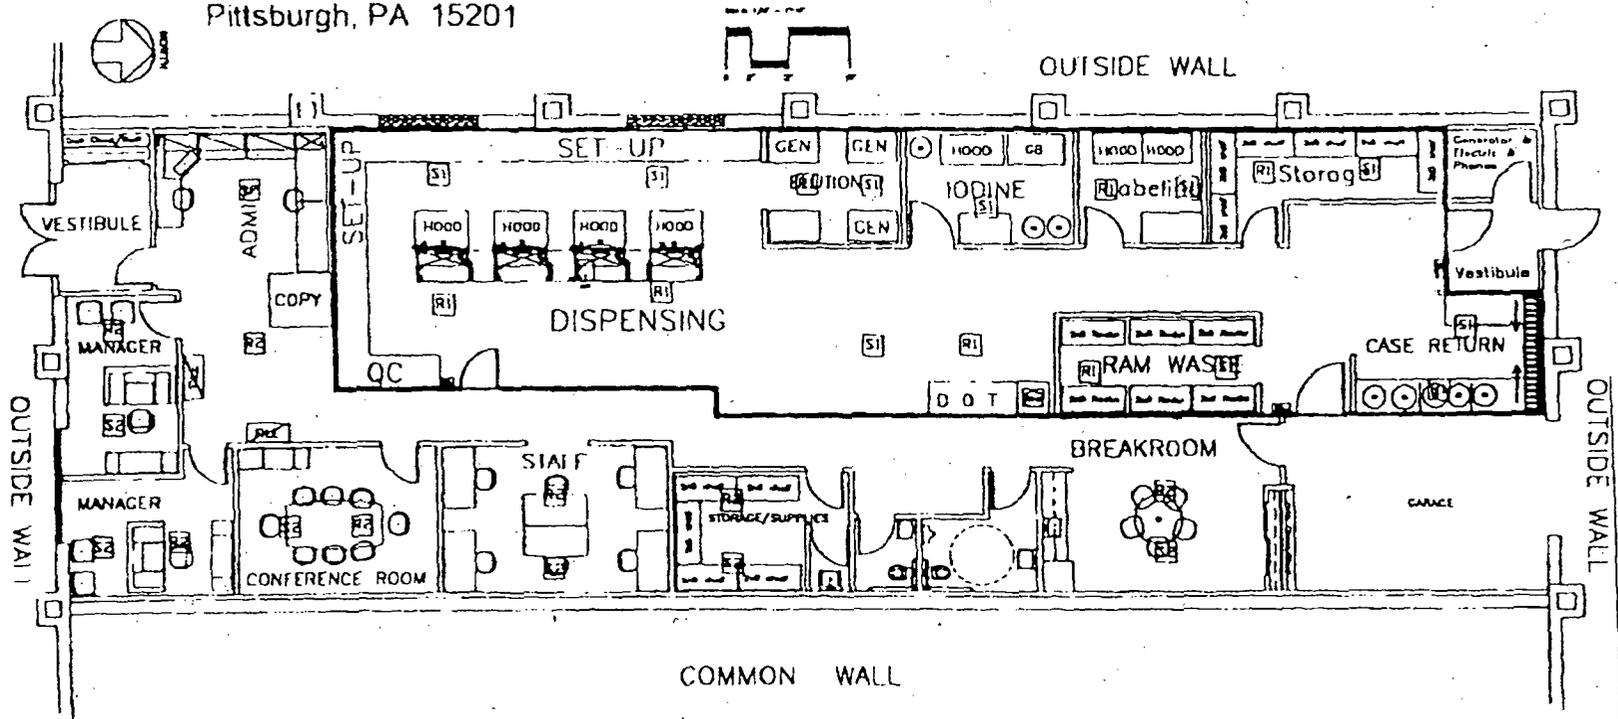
Facility Floor Plan. The restricted area is outlined in black.
